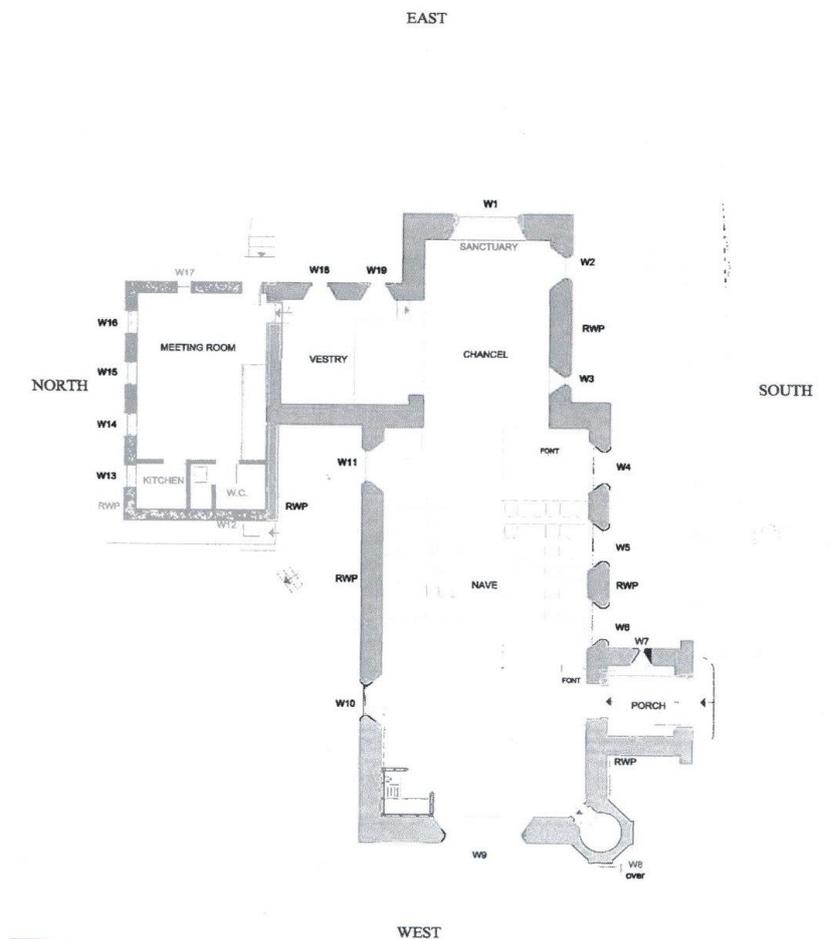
Architect's Sketch Plan of St. Catwg's Church
